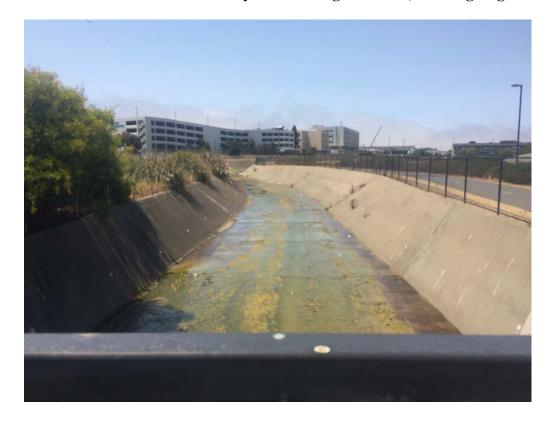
View to NW of western side of Parcel 2, adjoining BART vent facility in background
